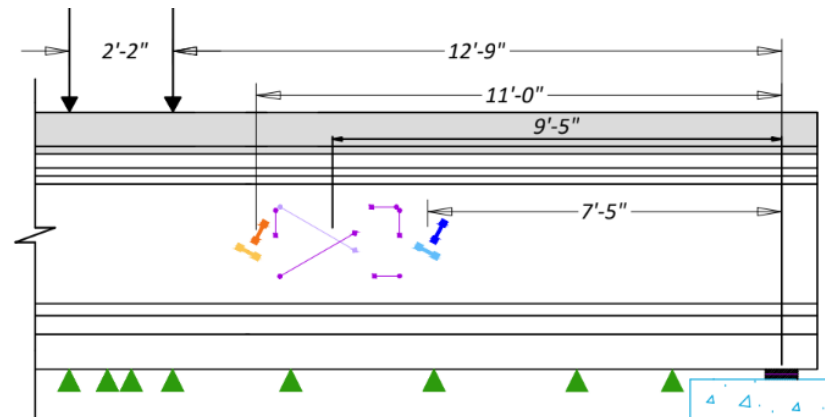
Tx34-2 Test Setup and Instrumentation for Shear Test 2 (North Face, Load near the Reinforced End).
